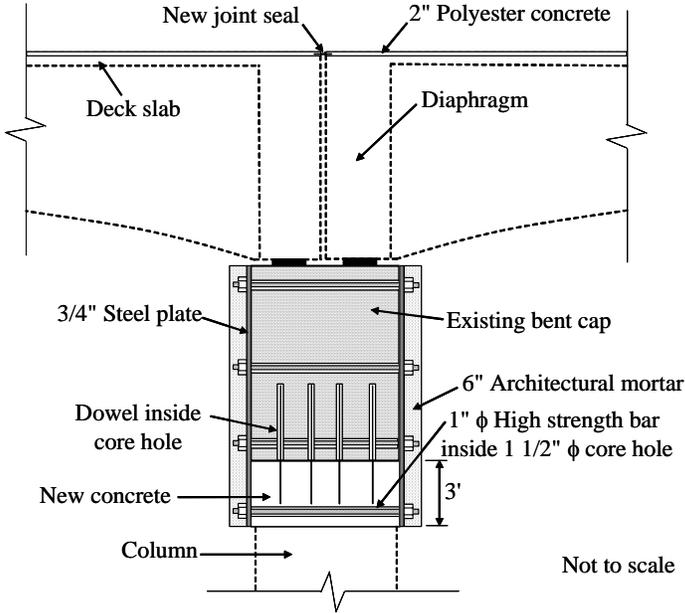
Retrofitting of Bent Caps by Concrete Bolsters
